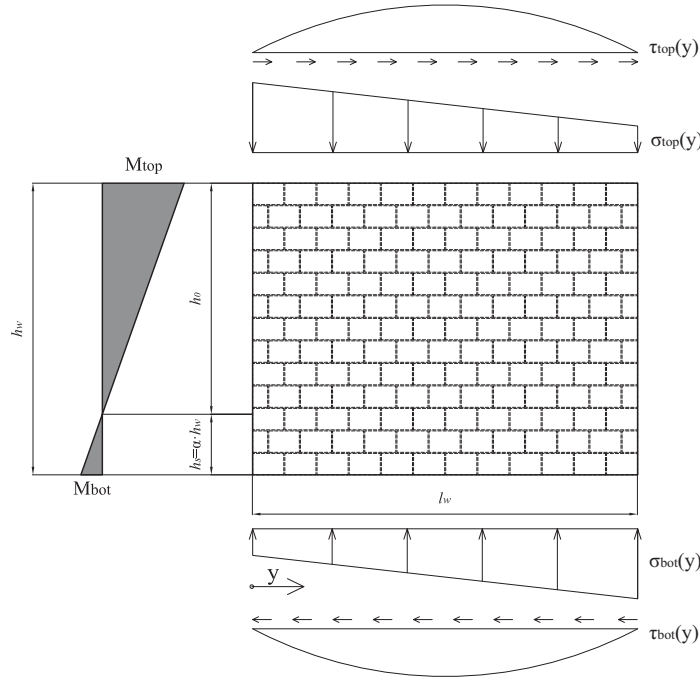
Wall subjected to the combination of vertical and horizontal load acting at its top
